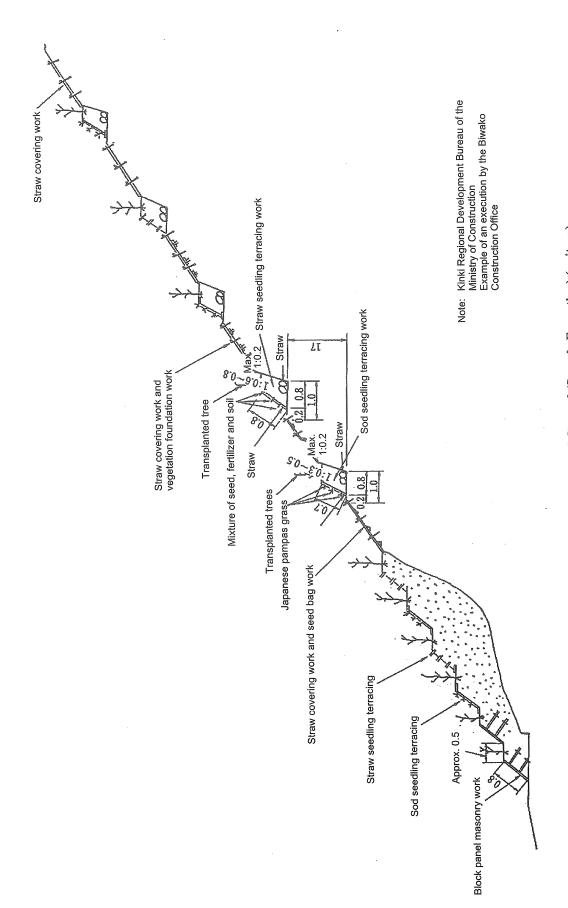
Section Drawing of Deforested Ground (Sample Execution) (unit: m)
